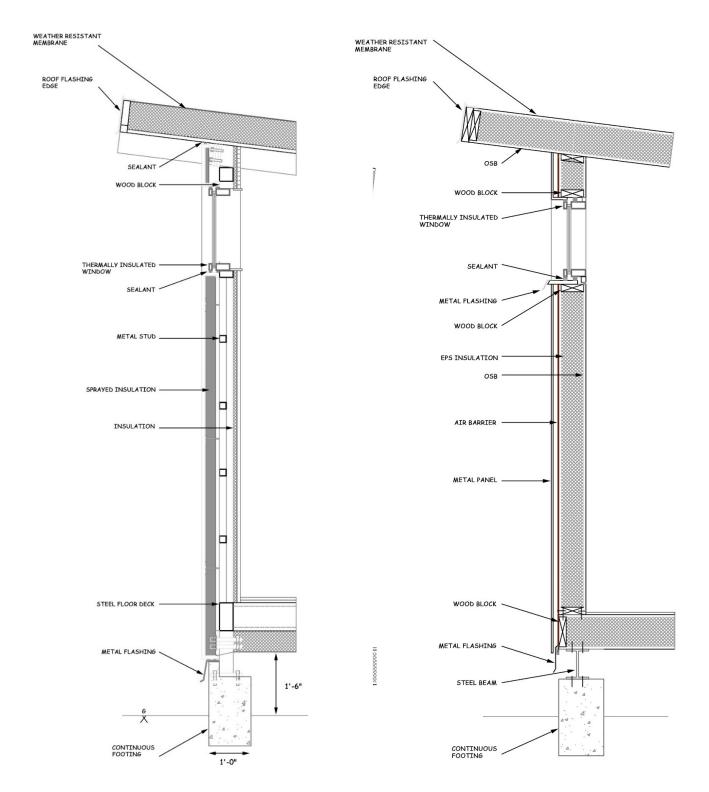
Updated Design of Glass-Fiber Reinforced Concrete on Metal Frame Façade.
